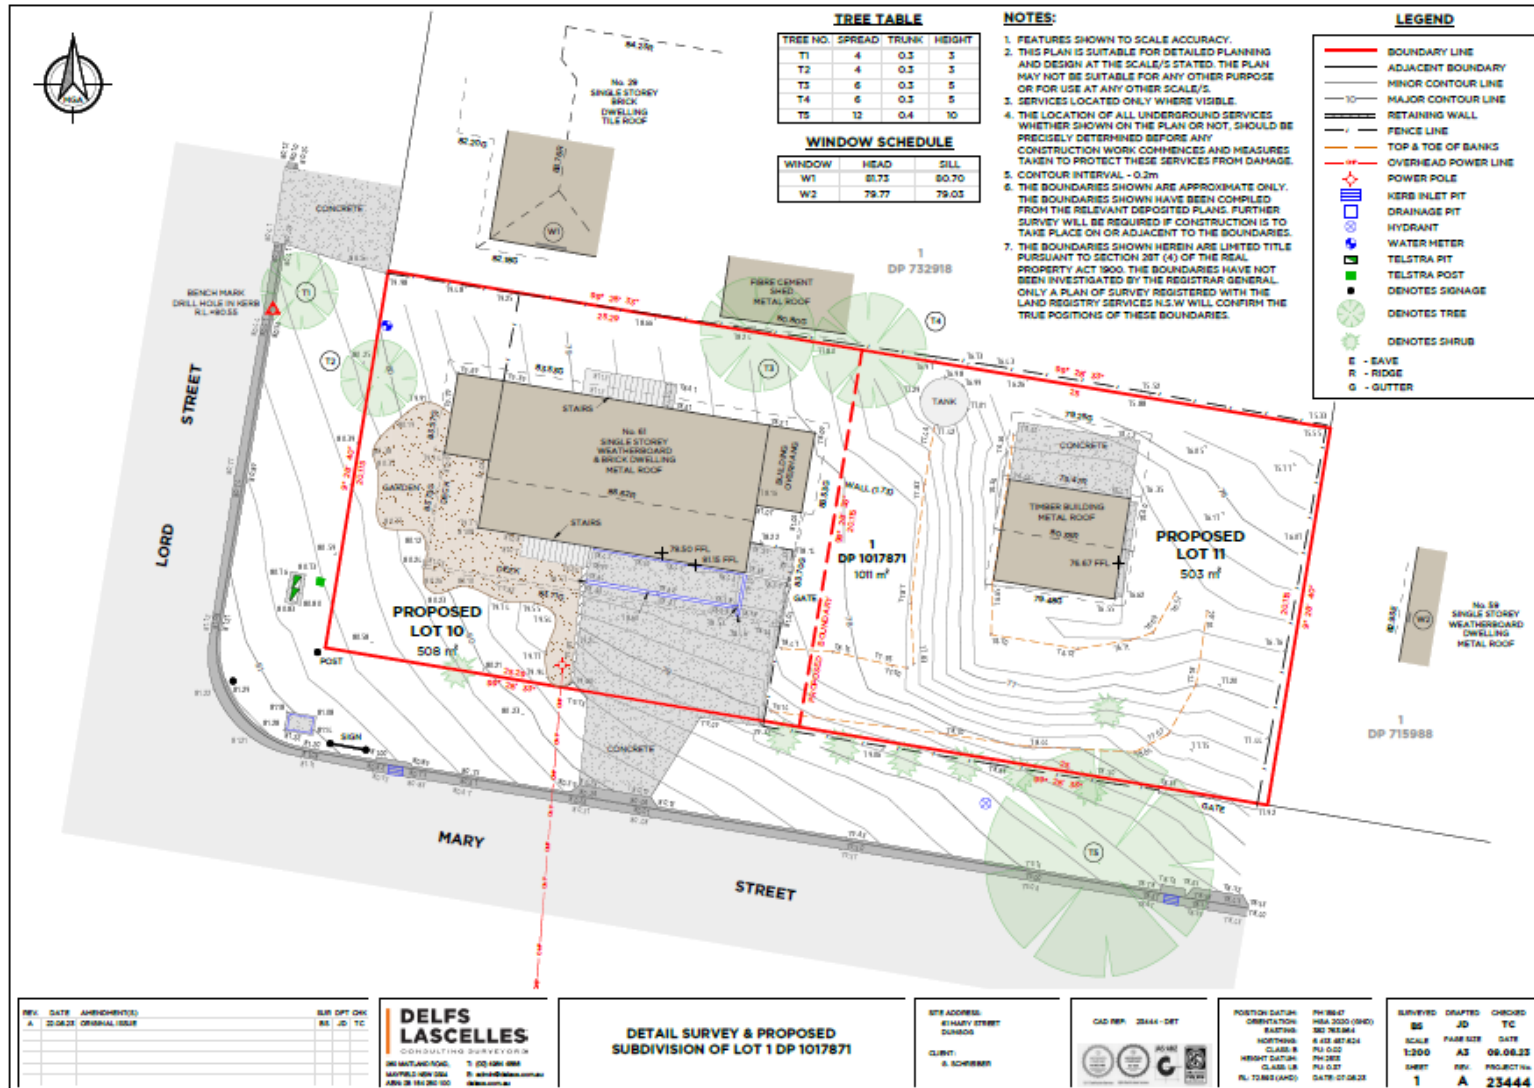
Proposed Subdivision Plan (Delfs Lascelles, 2023)
